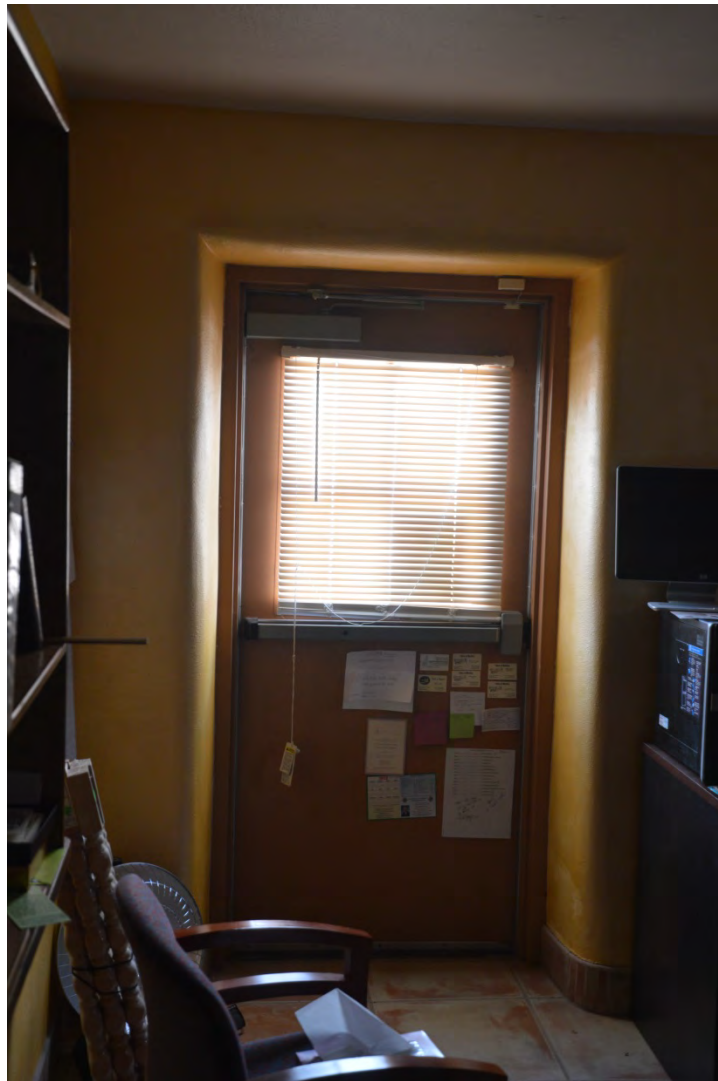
PHOTOS OF WINDOW TO BE REPLACED BY NEW DOOR
